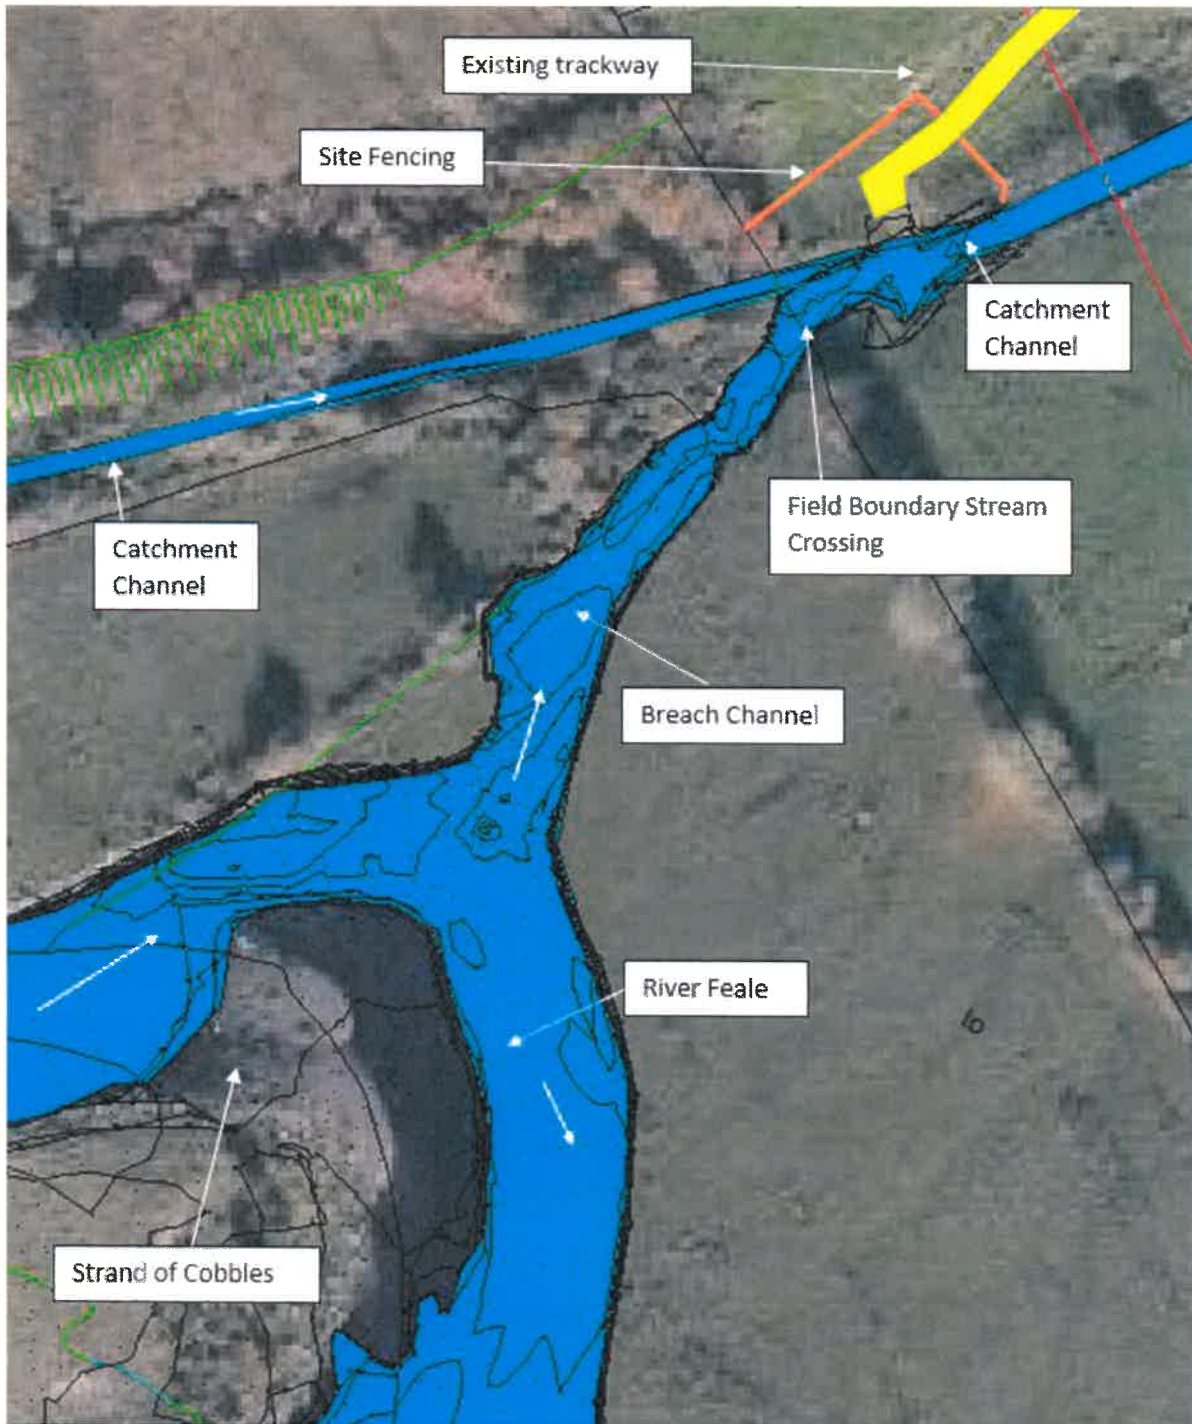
STEP 1: Establish Access to site left bank via existing field access tracks, Prepare materials for installation of ford across the river
